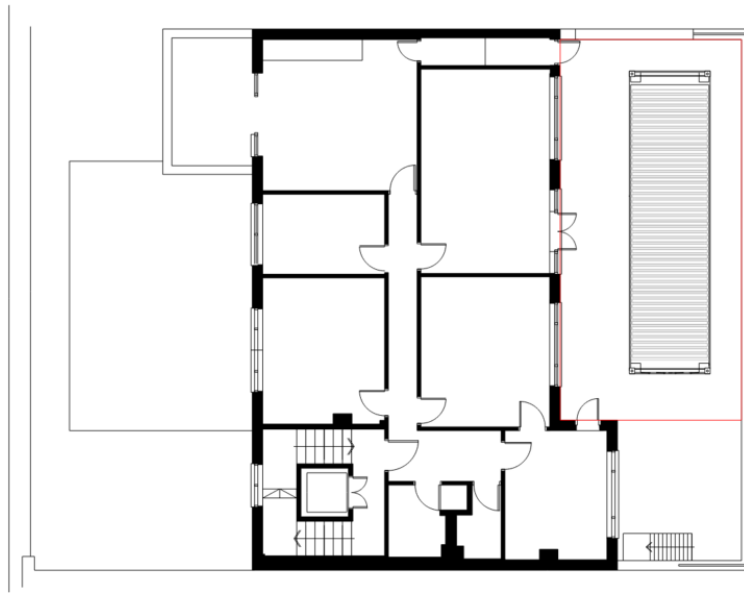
Fourth floor plan of existing building with the proposed shipping container. The rooftop terrace is hatched in red.
